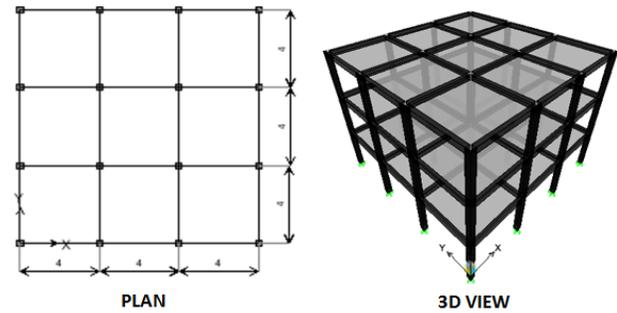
PLAN AND 3D VIEW OF THE THREE STOREY BUILDING
